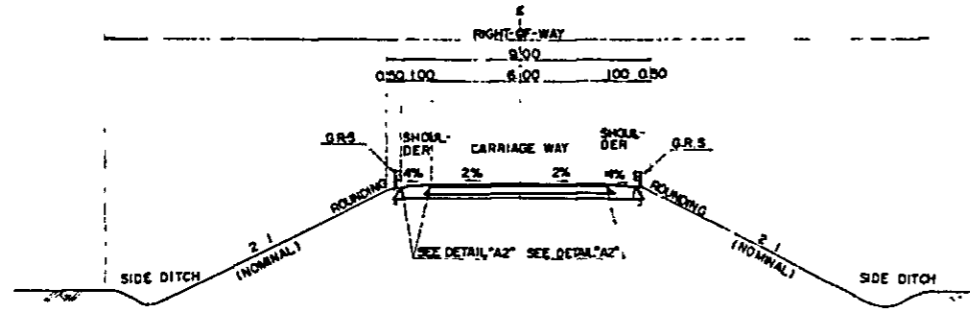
A TYPICAL ROADWAY CROSS SECTIONS
